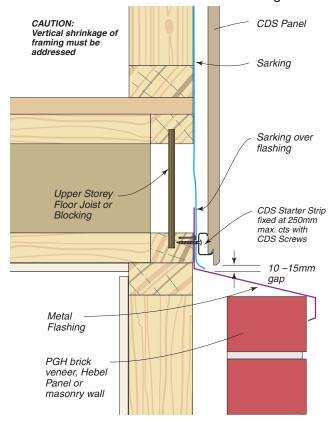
CDS Second Storey Junction with Masonry, Brick Veneer or Hebel Panels – In-line Framing
